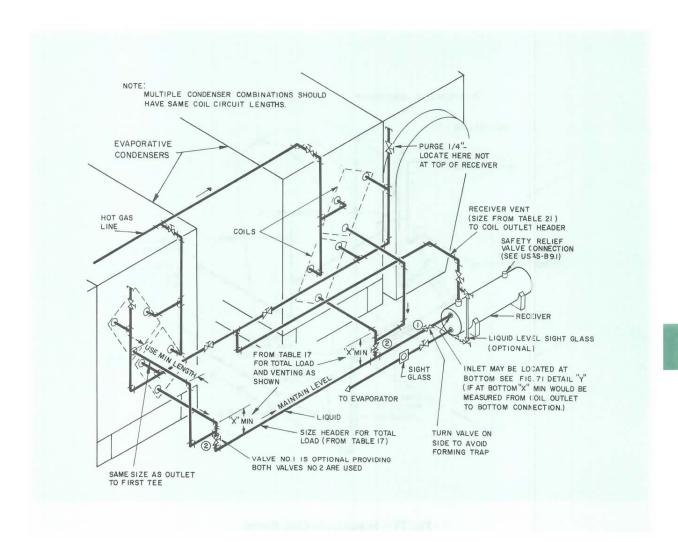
Hot Gas and Liquid Piping, Multiple Double Coil Unit
